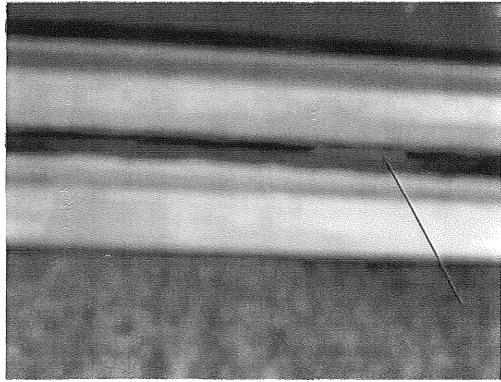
Interior light seen from exterior while viewing between the window frame and flashing on top of the curb wall
